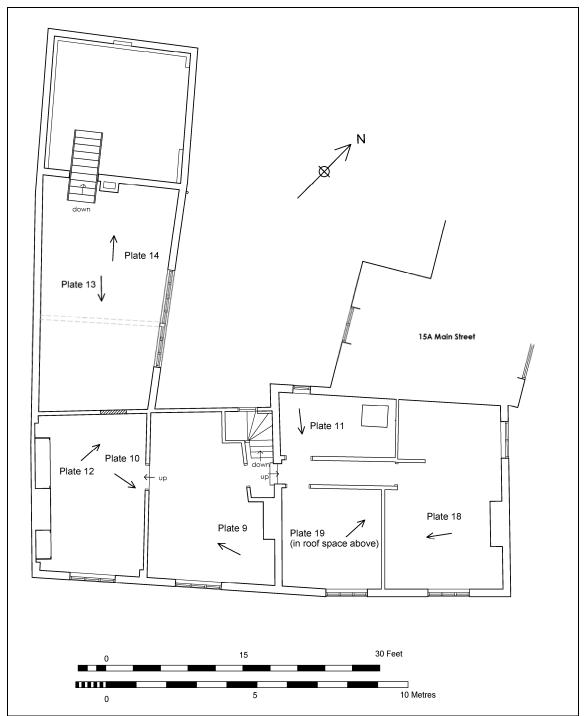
Location of Plates 9-14 and 18-19 on first floor plan.
